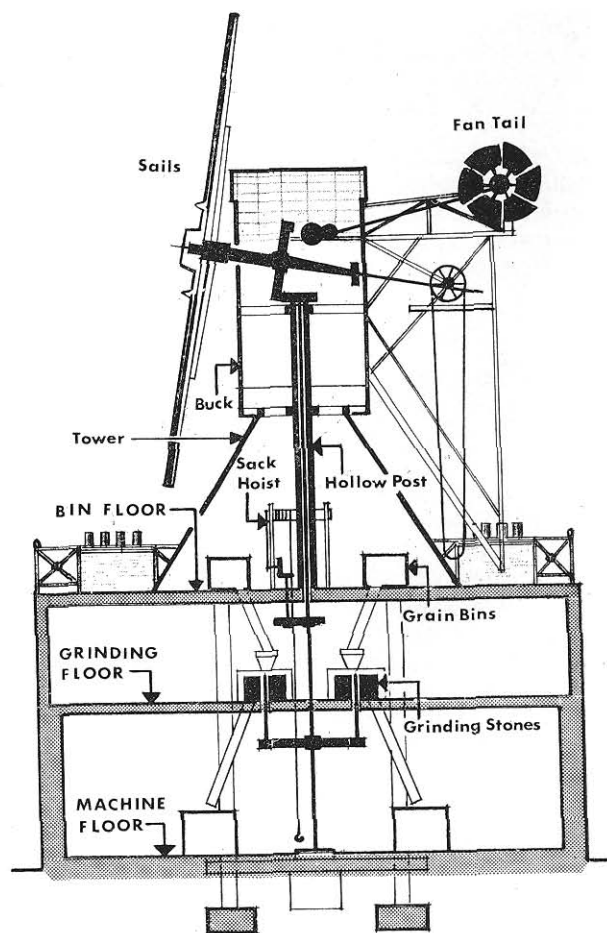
A section across the windmill illustrating the working machinery; see also front cover for an external view.
